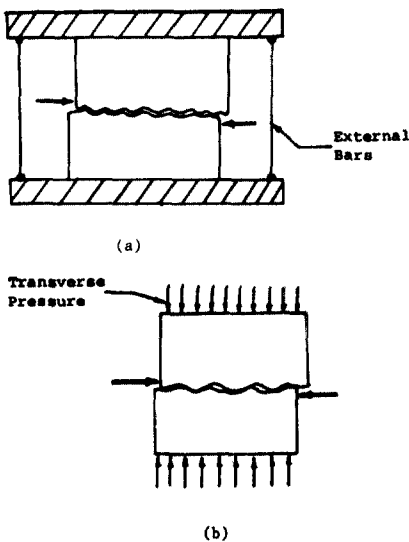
Agregate Interlock Test Technigues : (a) With Restraining Reinforcement and Variable Crack Width : (b) With Restraining Pressure and Constant Crack Width.
